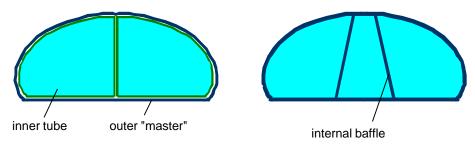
VARIOUS CROSS-SECTIONS OF TUBULAR WATER-FILLED SYSTEMS: INTERNAL AND EXTERNAL TUBES: "WATER STRUCTURES" AND "AQUADAM" (LEFT); INTERNAL BAFFLES: "AQUA BARRIER" (RIGHT)
